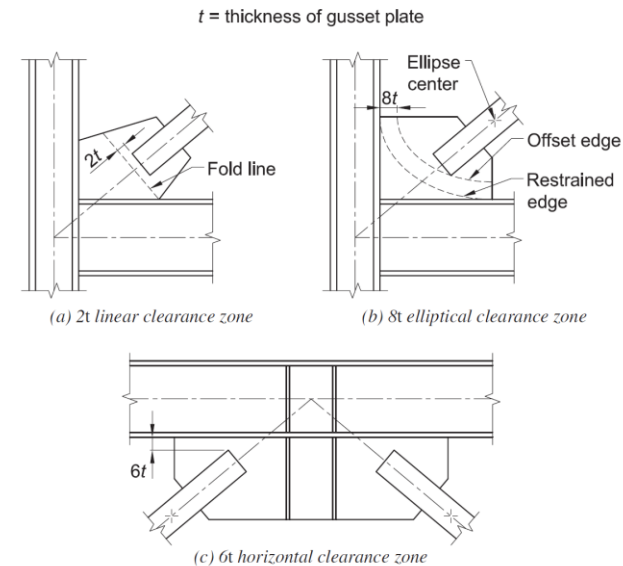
Brace-to-gusset plate requirement for buckling out-of-plane bracing system.
